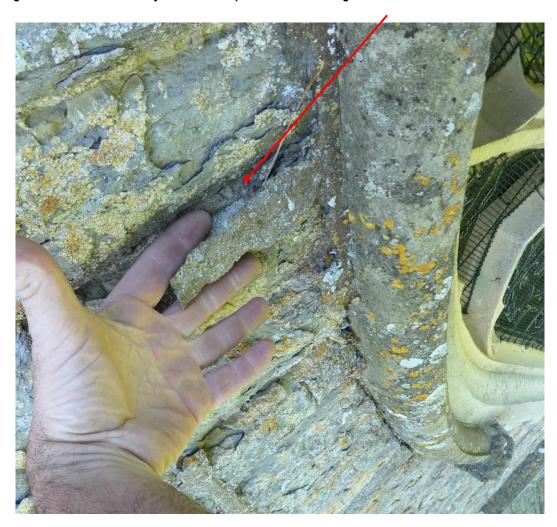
P1000455 Example Badly Decayed Masonry Around West Window Cement Pointing in 2nd Stage
